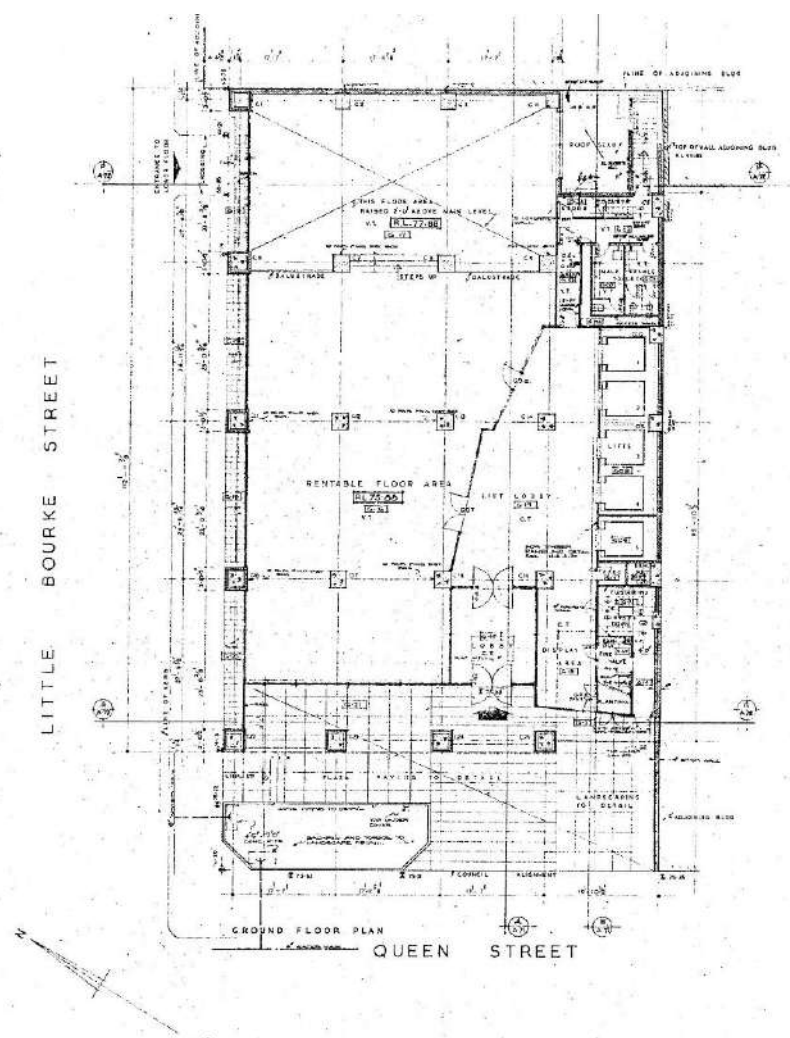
Ground floor plan showing the plaza and landscaped area off Queen Street. Drawing by E & G Kolle & Associates, dated March 1964 (BAP).
